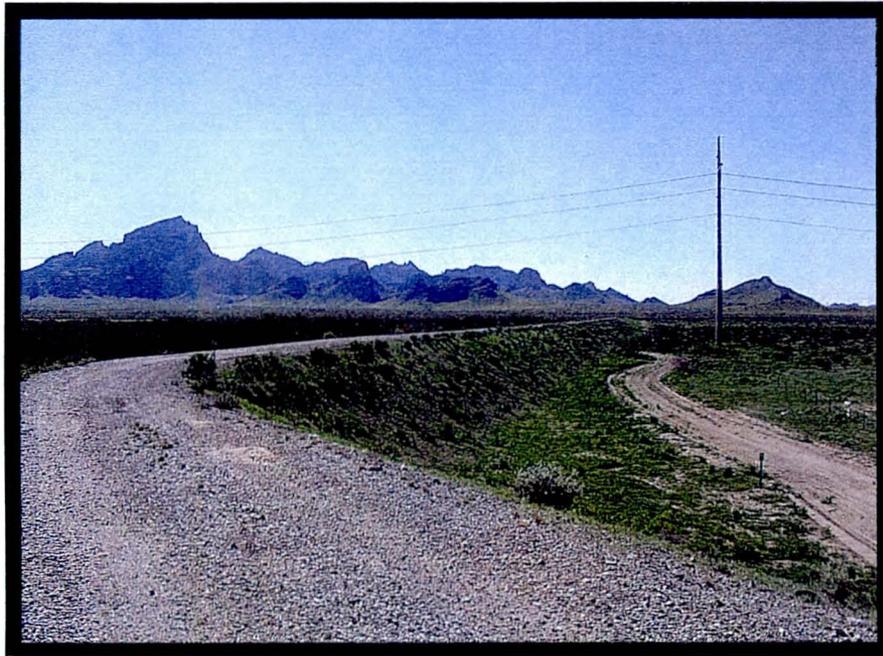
Downstream Slope from Stations 60+50 to 65+00:
